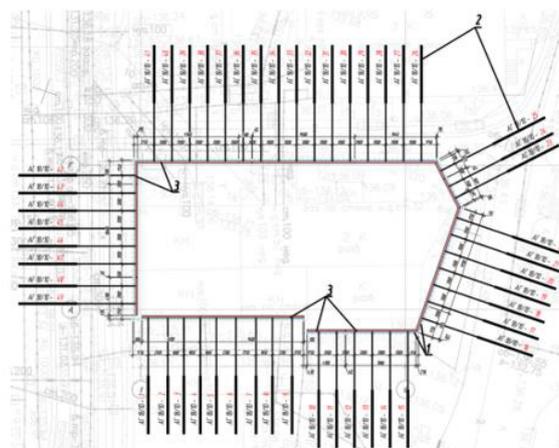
Scheme of placement of soil anchors ERT fence of the pit: 1 - drill injection piles ERT; 2 - ground anchors ERT of the first level; 3 - monolithic reinforced concrete strapping belt.
